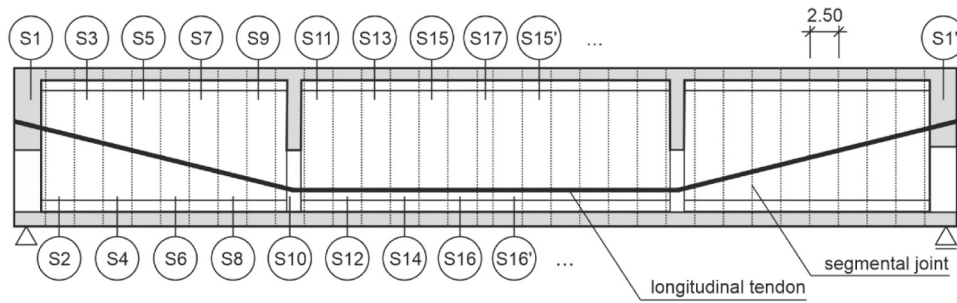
Segmentation of the box girder bridge (longitudinal section).
